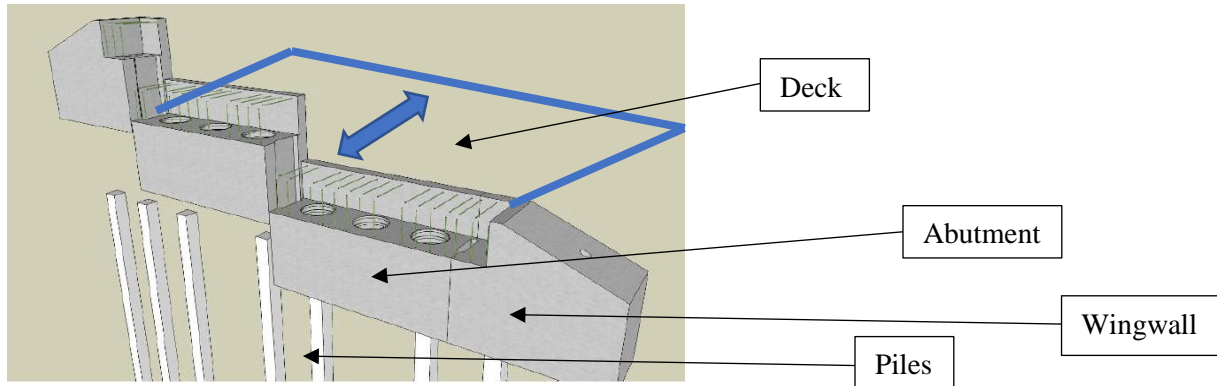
Prefabricated Integral Abutment Bridge without deck (3-D). Source: [6]
